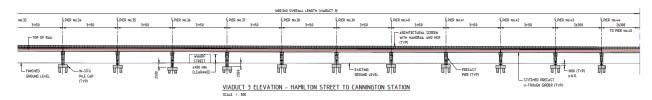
Viaduct Elevation – Hamilton Street to Cannington Station
